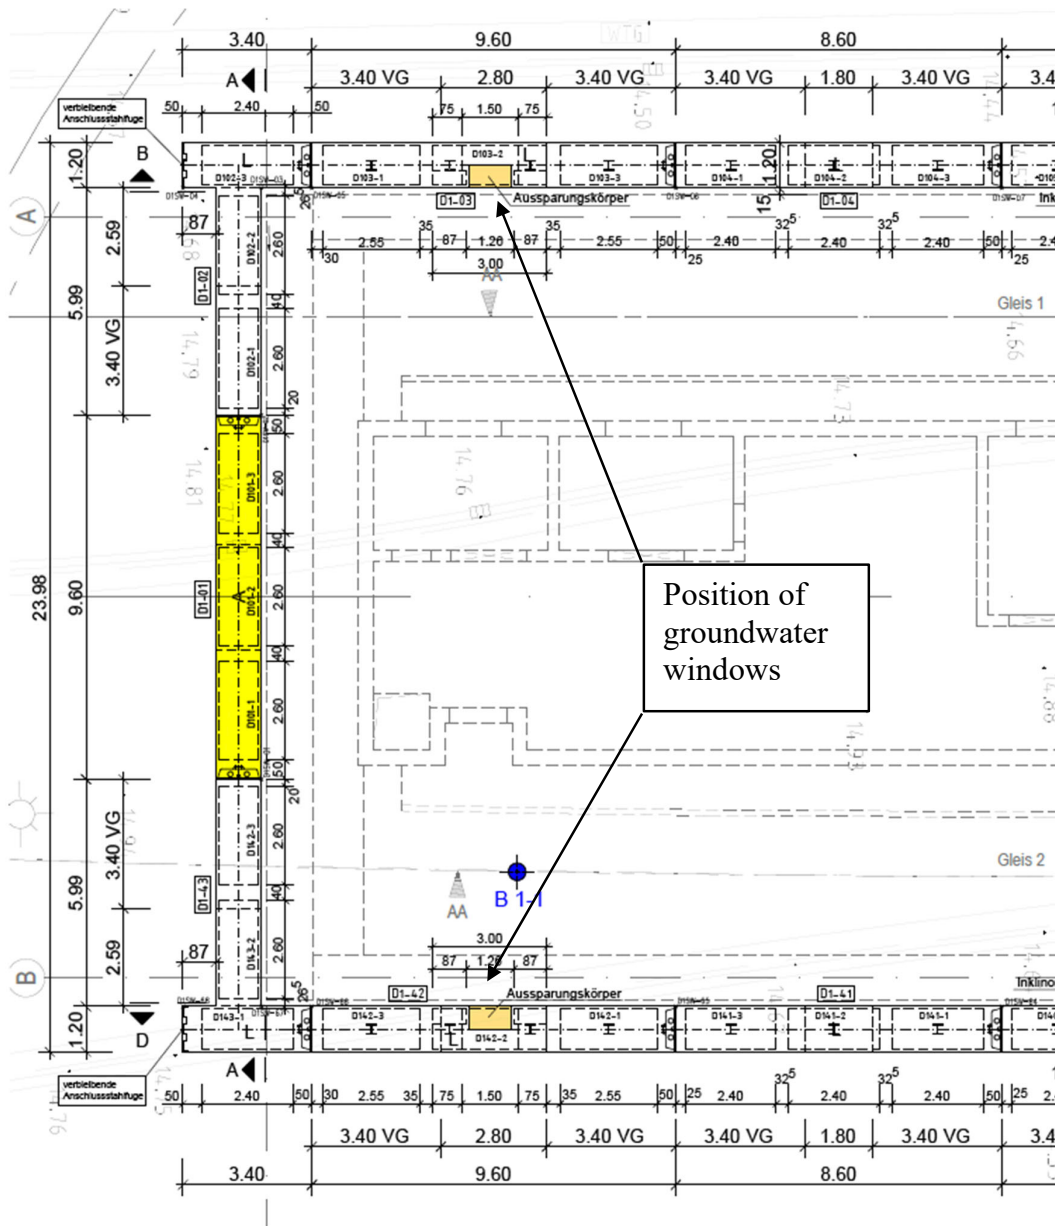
Ground plan of the D-wall construction pit showing the position of groundwater windows.
